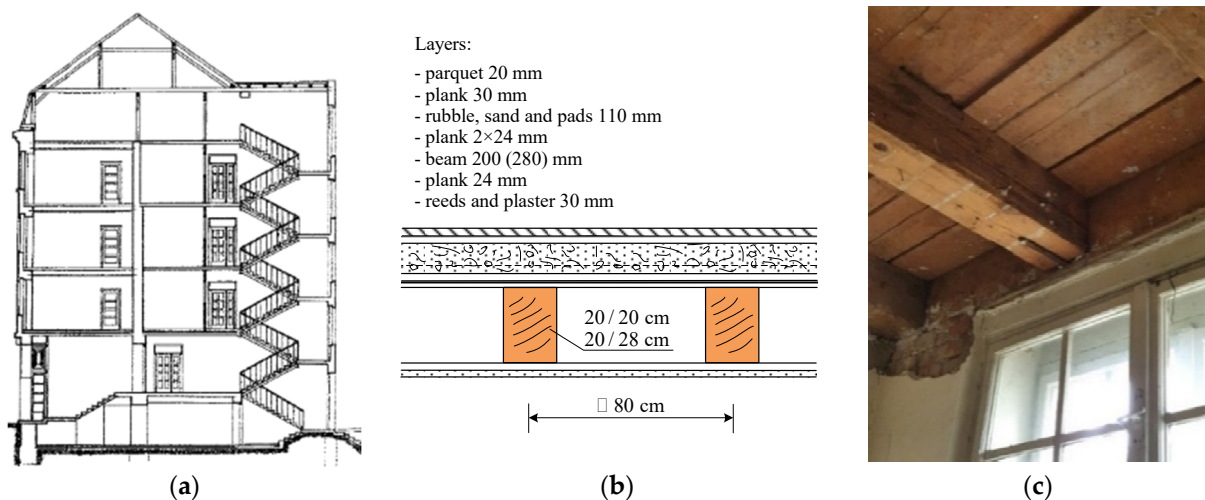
Cross-section and timber floor structure. (a) cross-section of the building; (b) layers of the timber floor structure; (c) photograph of the timber floor structure.
